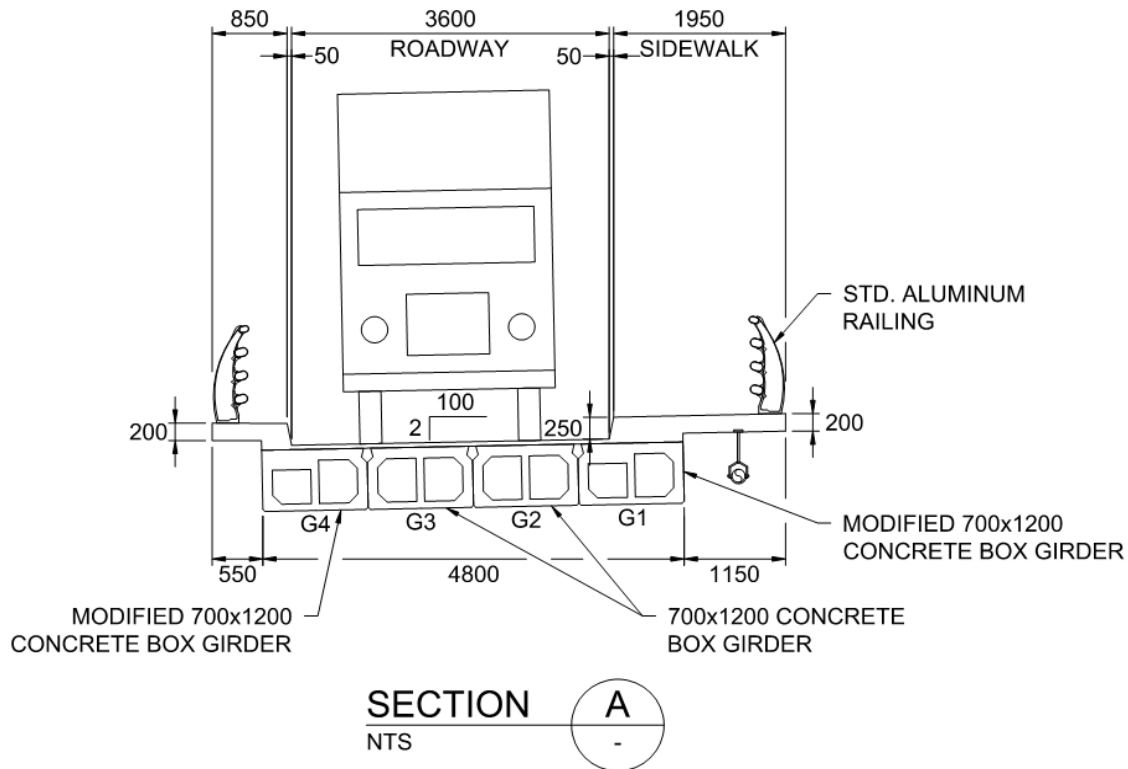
Isleview Place Bridge over Alberta Creek (Lower) – Section
